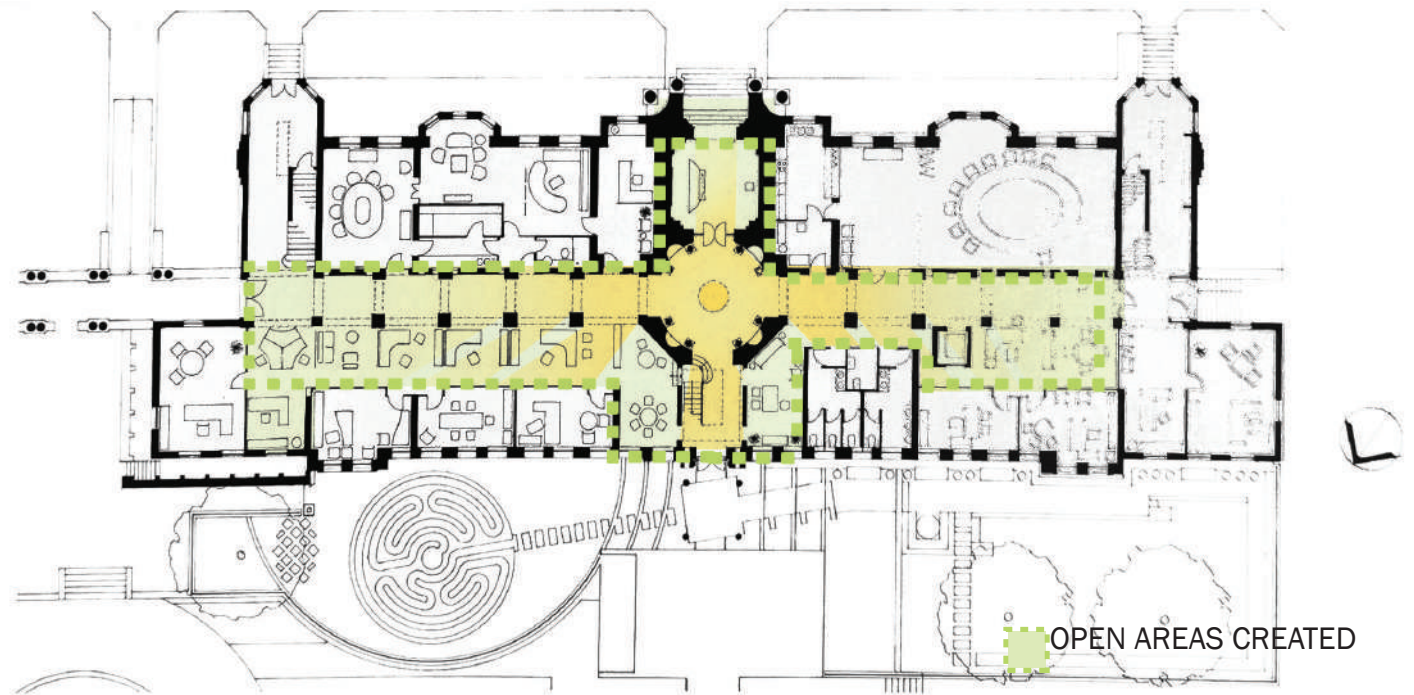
Ground floor plan adapted by Author (Herholdt, 2014: 274)
